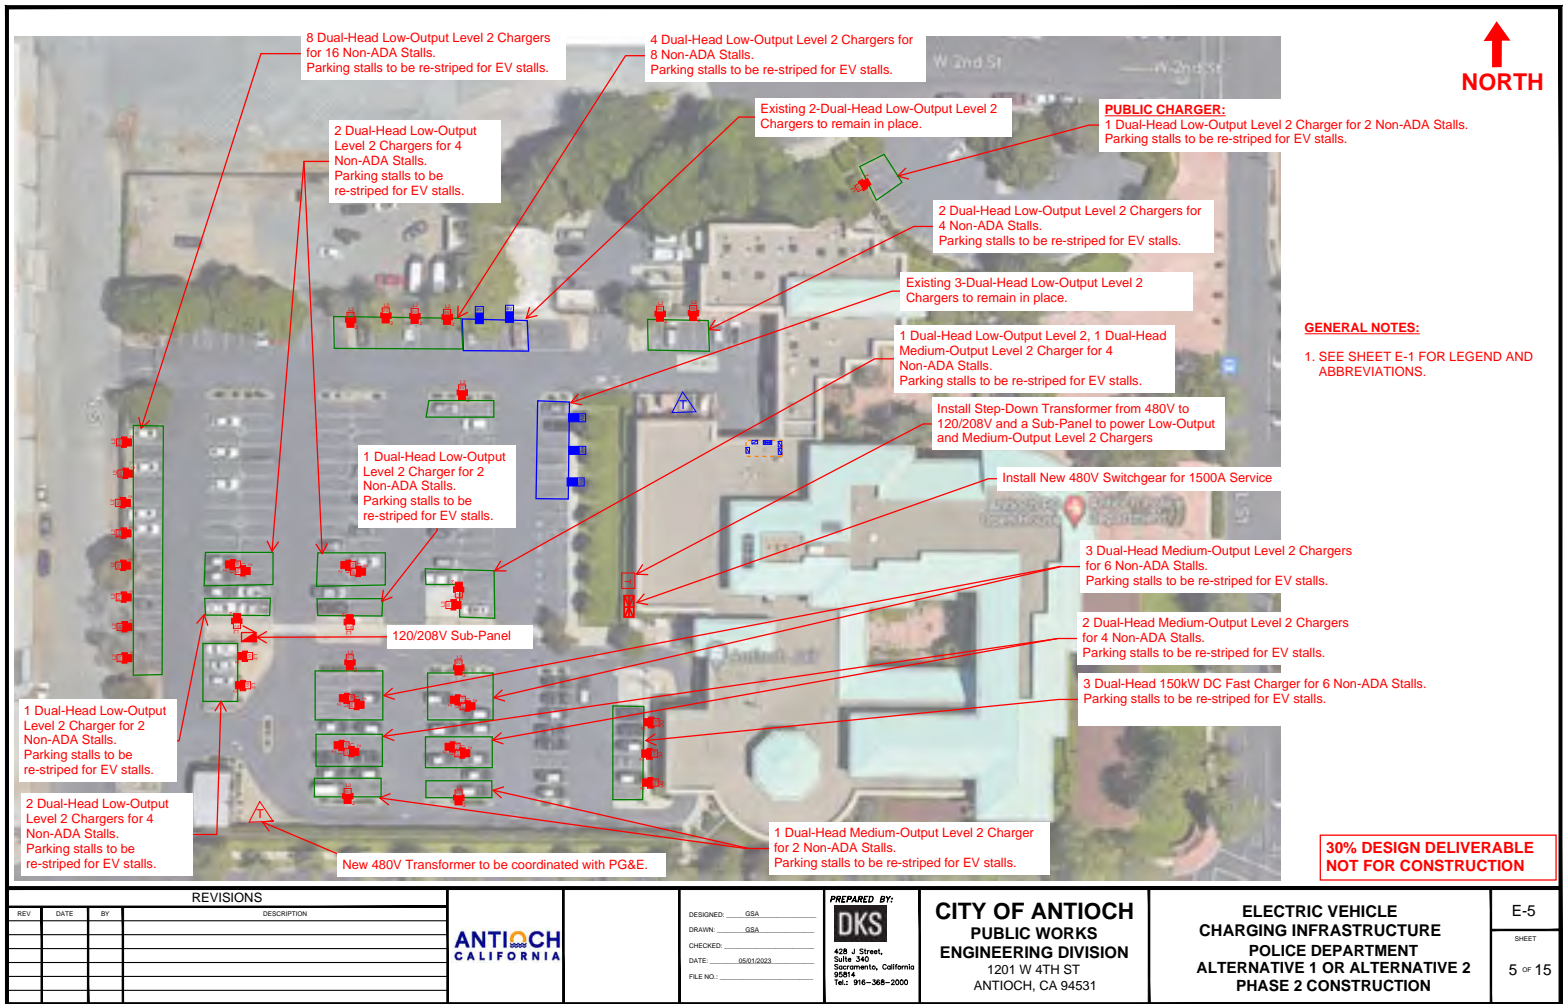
Typical Conceptual EV Charger Design Plan for a Medium-Sized Fleet Facility
